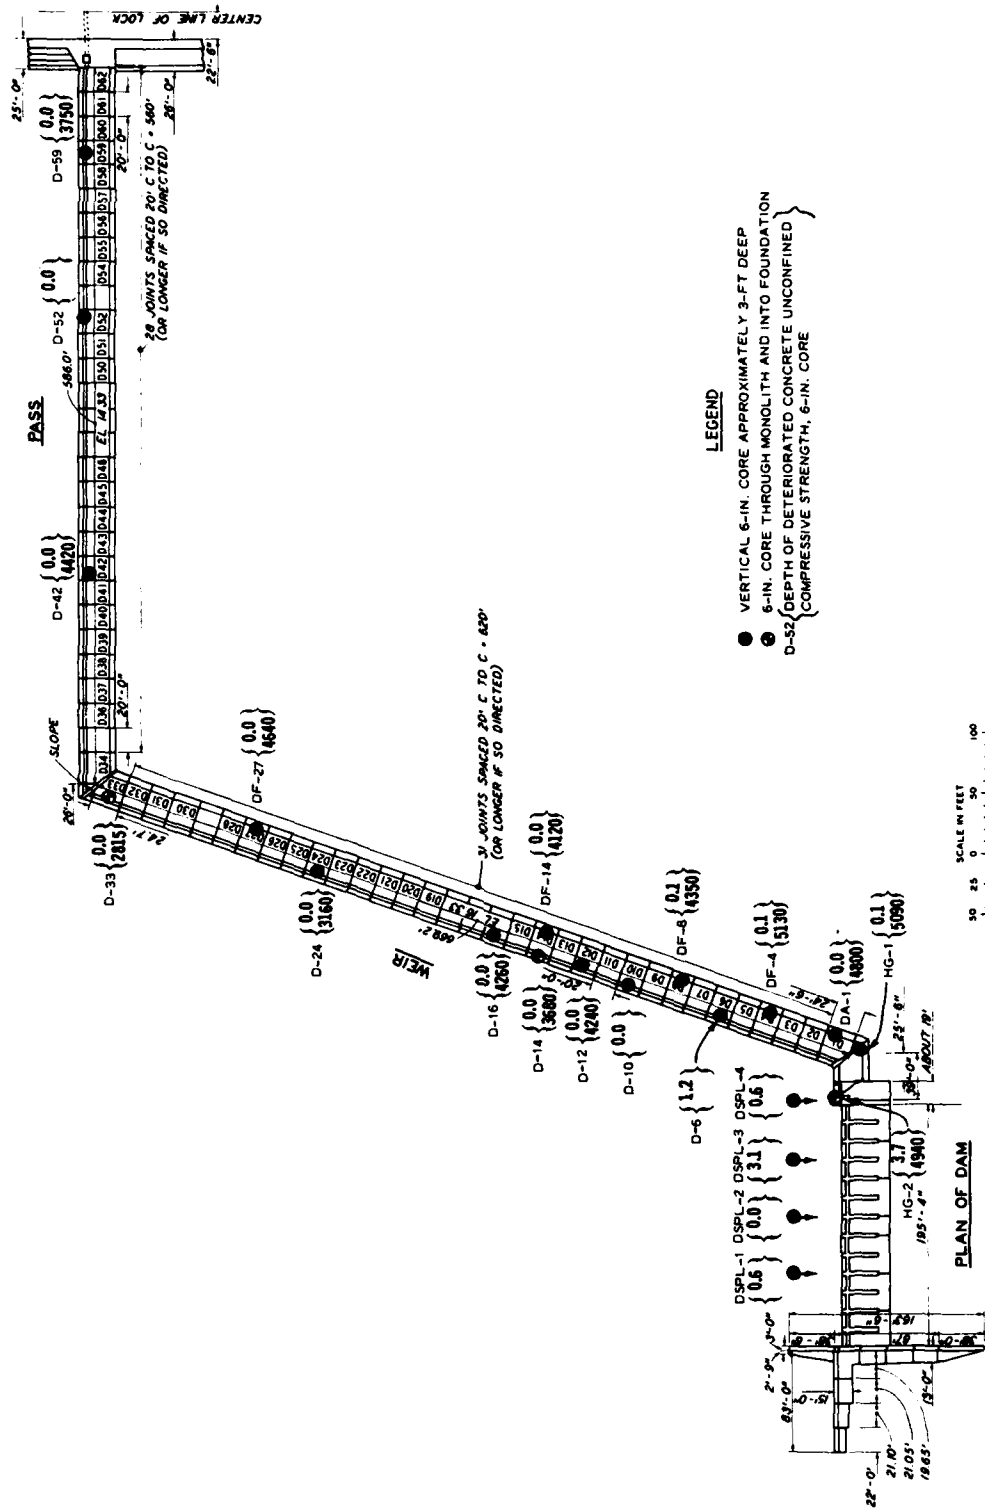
Core locations, depth of deteriorated concrete, and compressive strength below deteriorated concrete--dam
